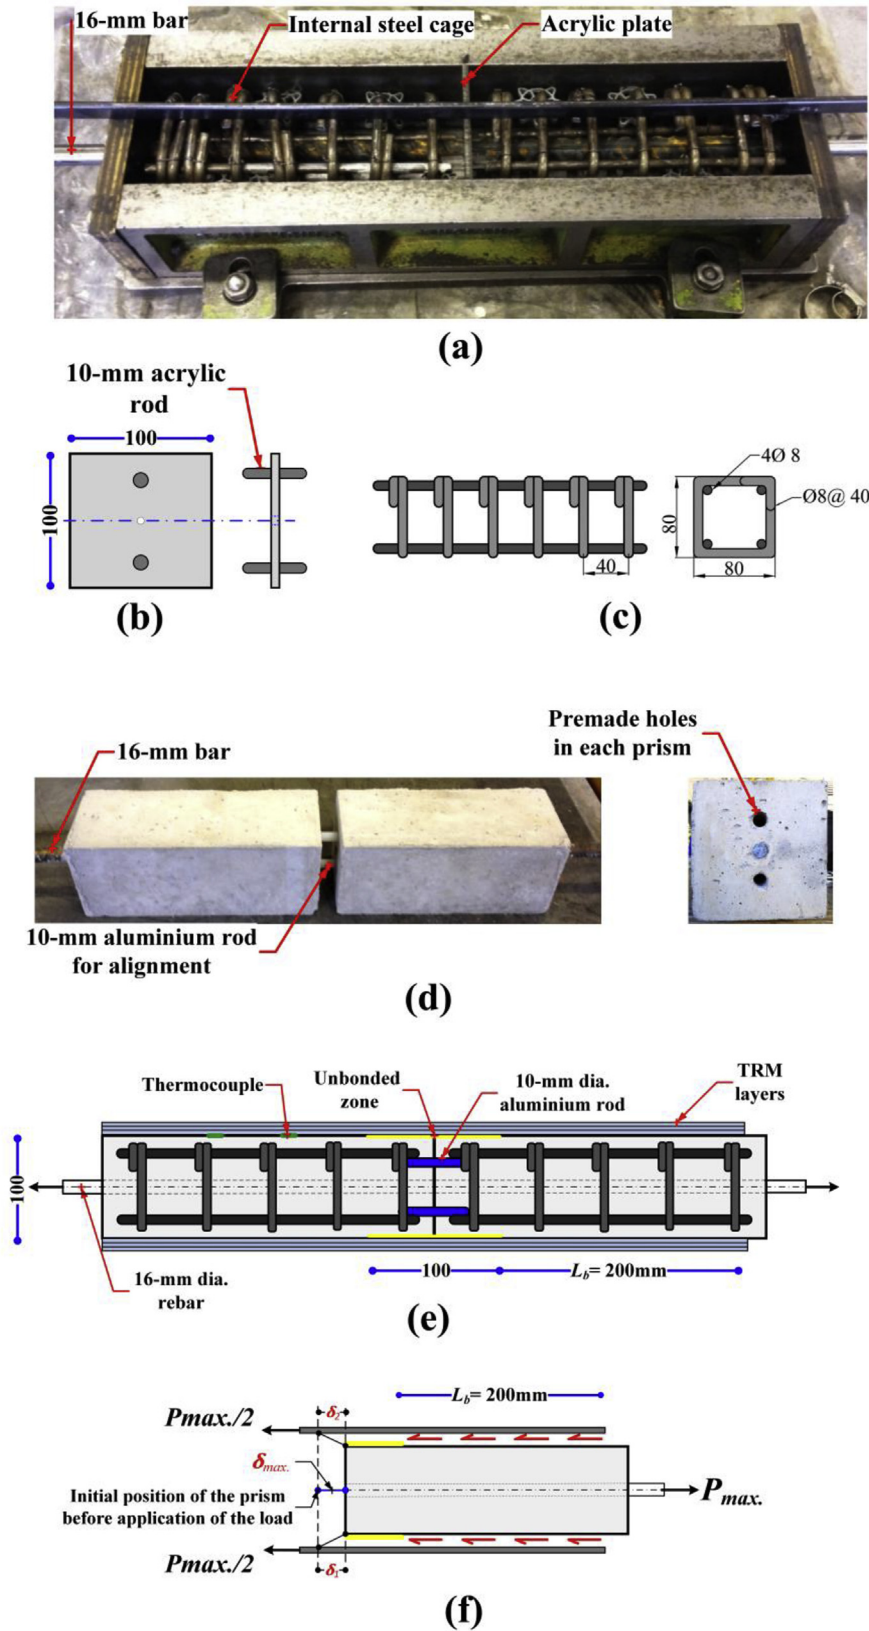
Specimen details; (a) specimen preparation; (b) details of acrylic plate; (c) details of internal reinforcement; (d) details of alignment of the prisms; (e) overall design details of the test specimen; and (f) schematic diagram for the free body diagram of the tested side of the specimen (Dimensions in mm).
